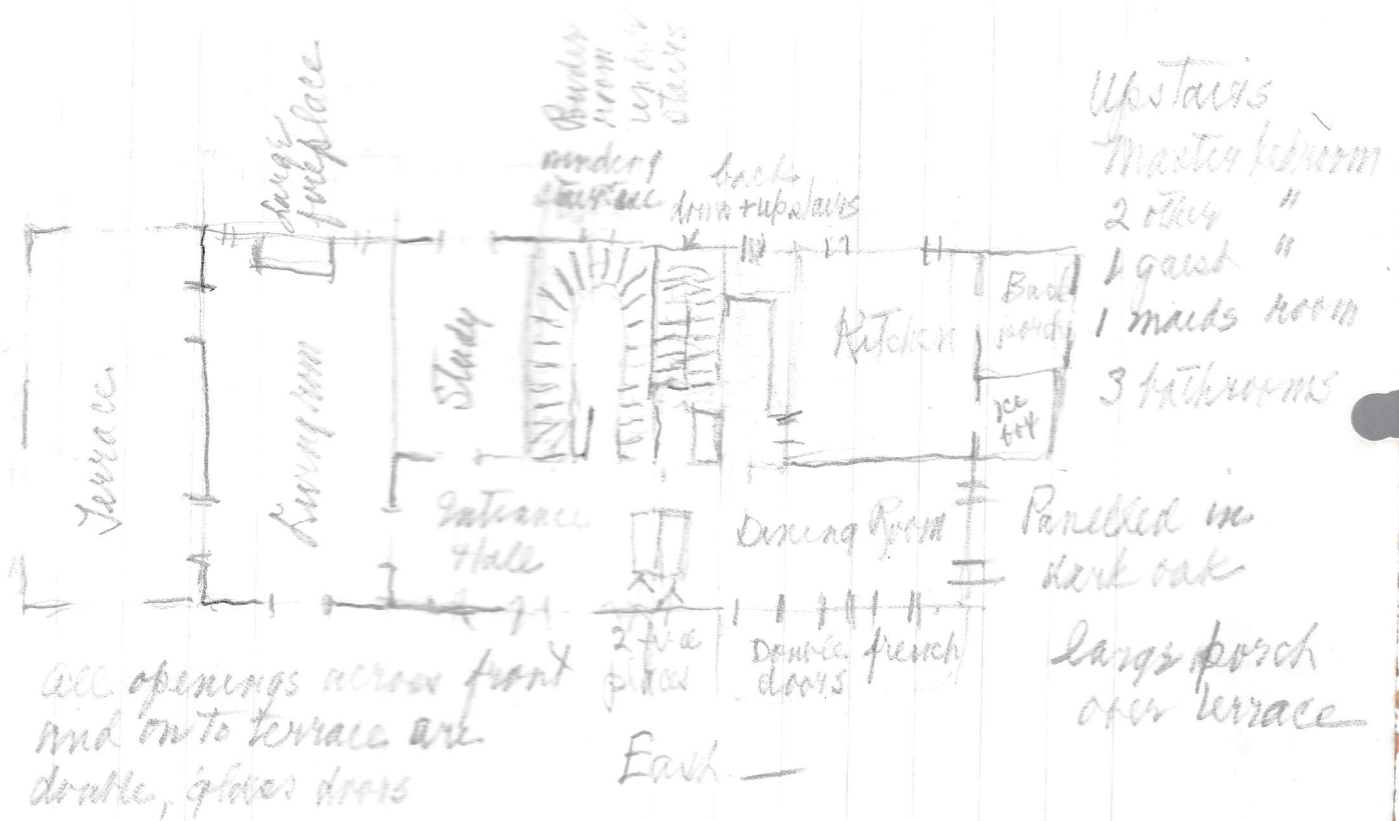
VIEW AND FIRST FLOOR PLAN—HOUSE
